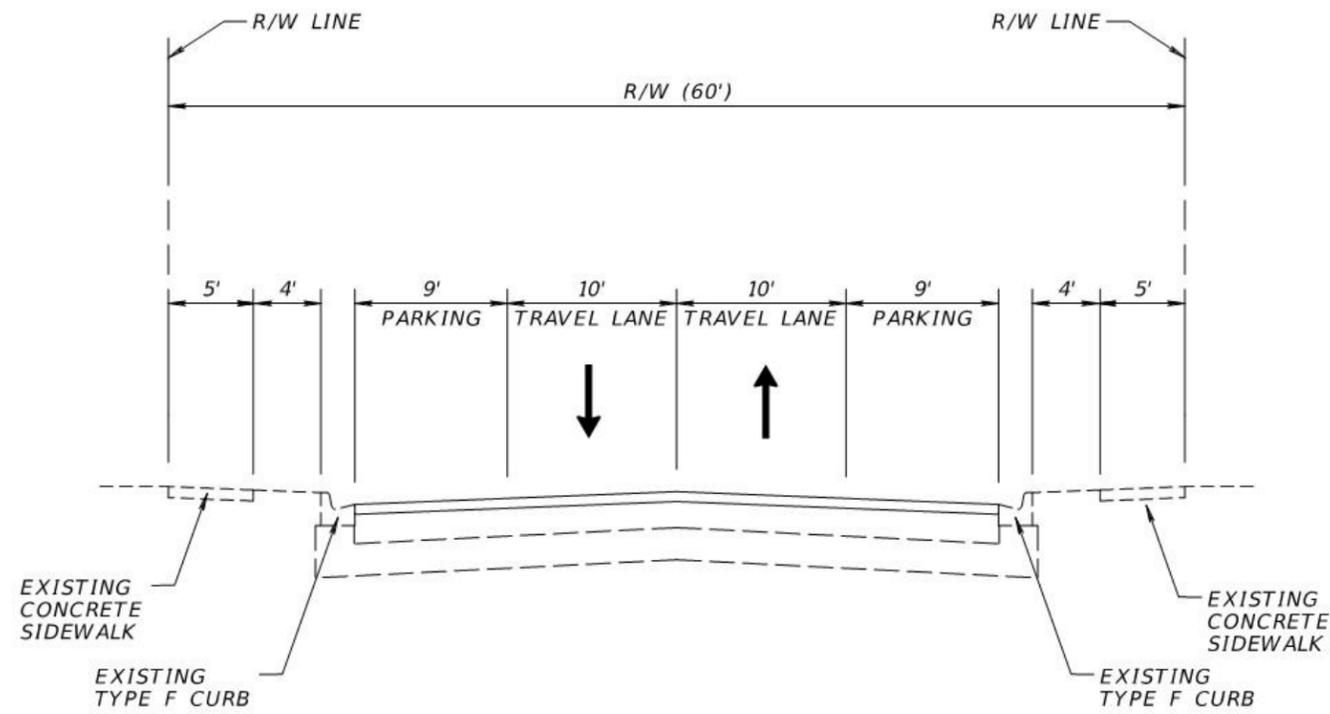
Typical section of MLK Drive (North of Cervantes Street)
